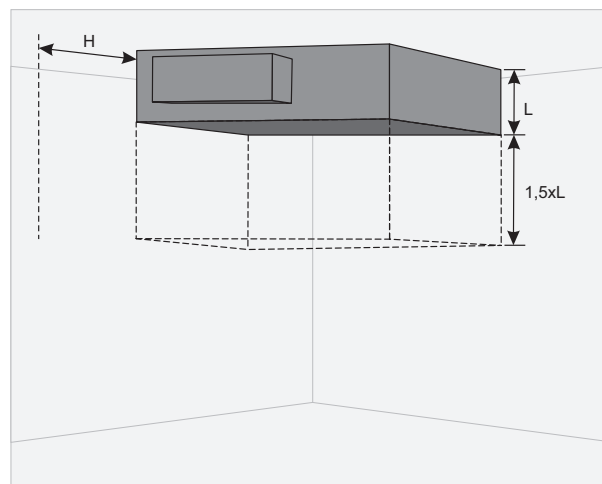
Min. distance to open the door - $1,5xL$; Min. distance to open the control box door - $H > 400$ mm.
